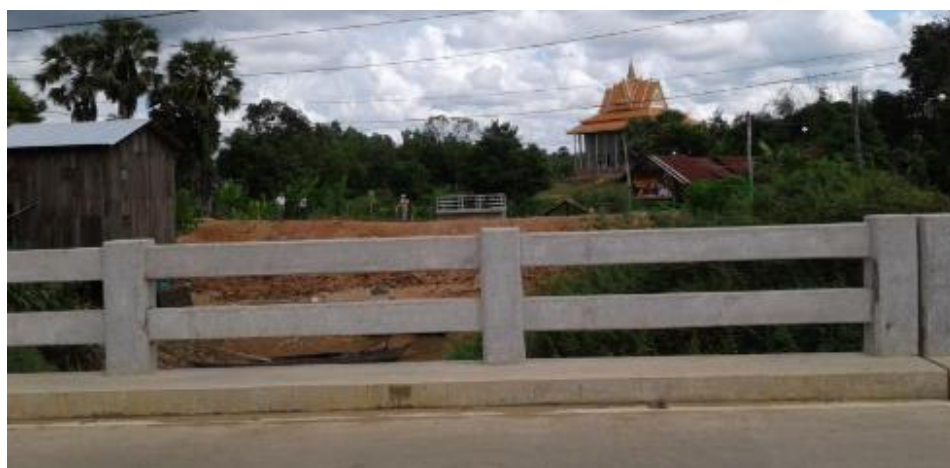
Proposed Automation of Floodgate and Installation of Pump Station at Dam Nak Bridge
